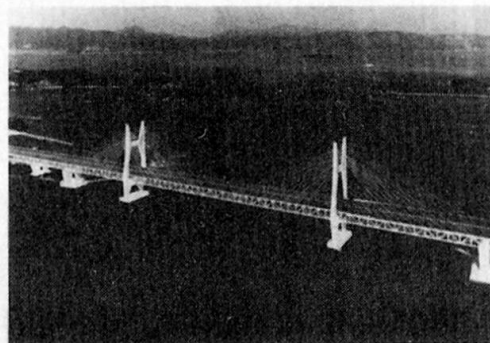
Aerial View of Hitsuishijima Bridge (photo-montage)
